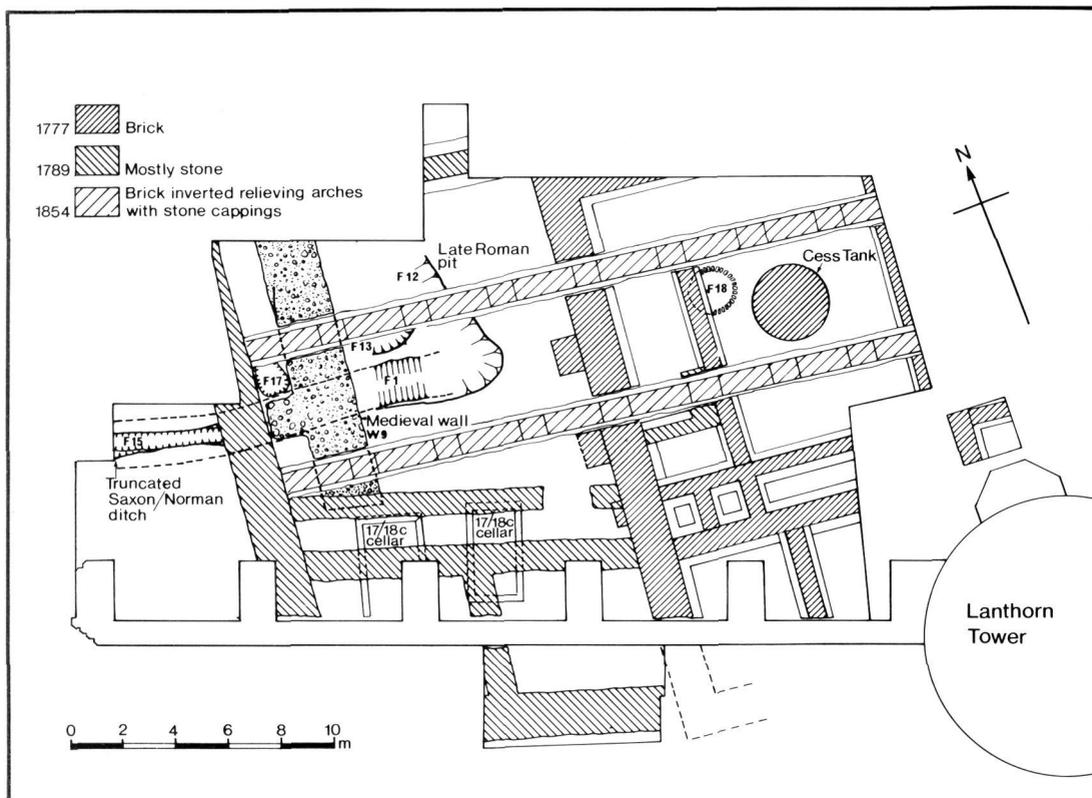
Inmost Ward 1955–77: General plan of excavated features.
